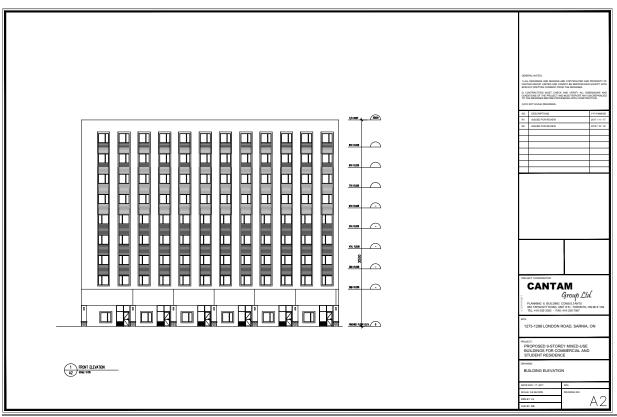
Proposed Typical Front Elevation (Credit to Cantam Group Ltd.)
